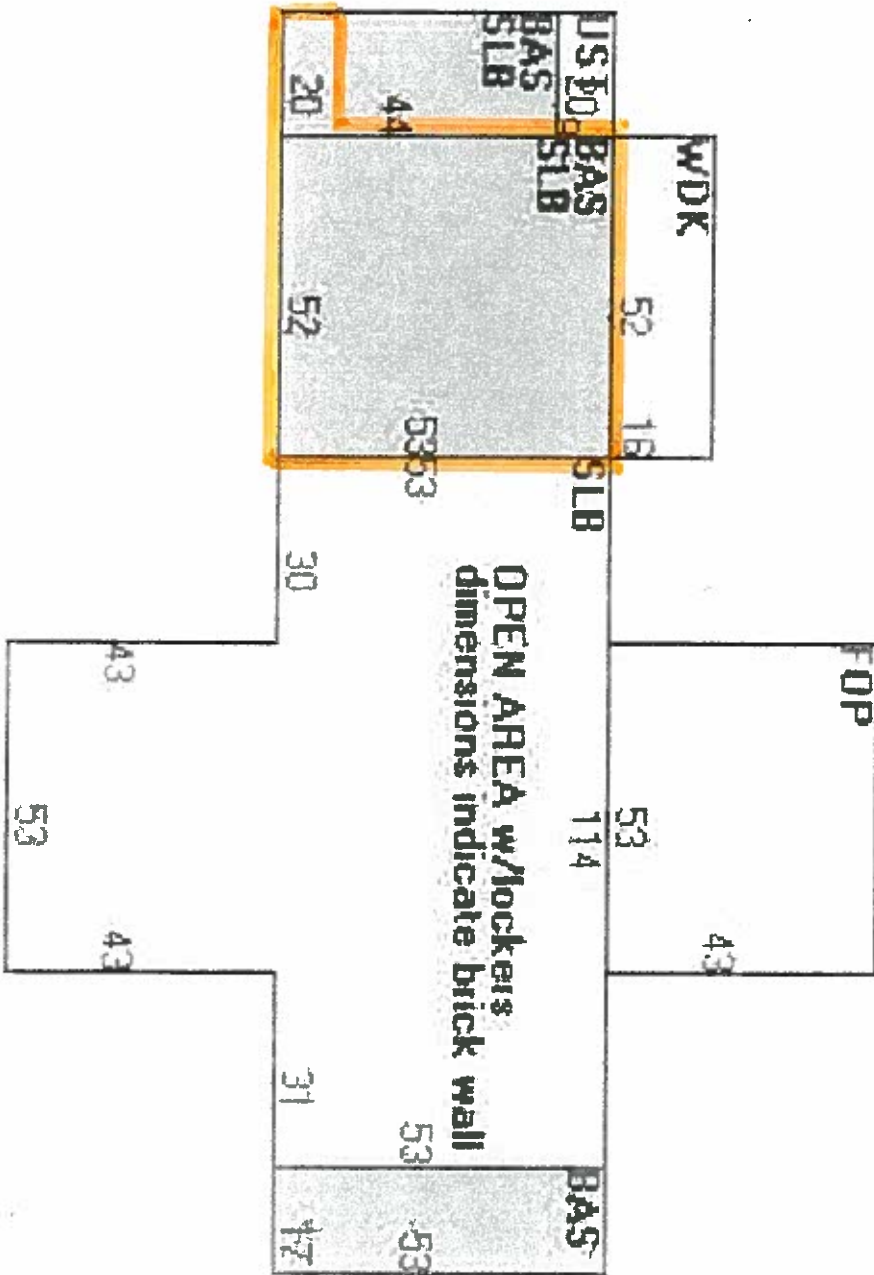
EXHIBIT B: FLOOR PLAN OF LONGSHORE PAVILION
